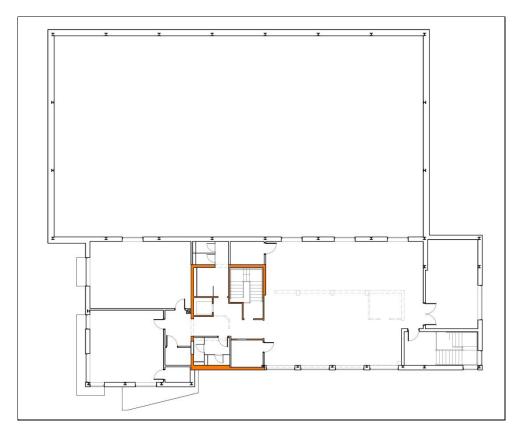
Simplified First Floor Plan showing extensions, areas of existing building to be retained, and accommodation to be demolished (indicated by dashed lines)
